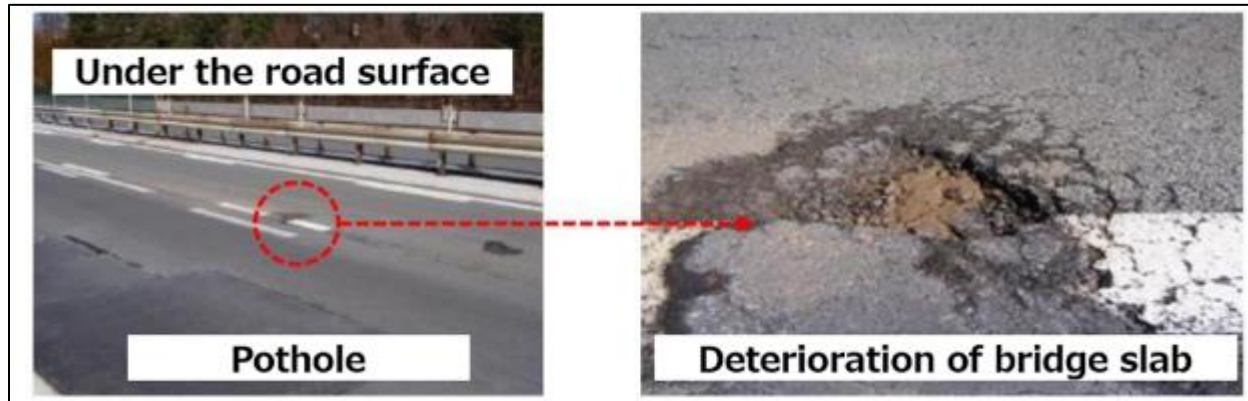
Example of pavement damages caused by concrete slab deterioration.
